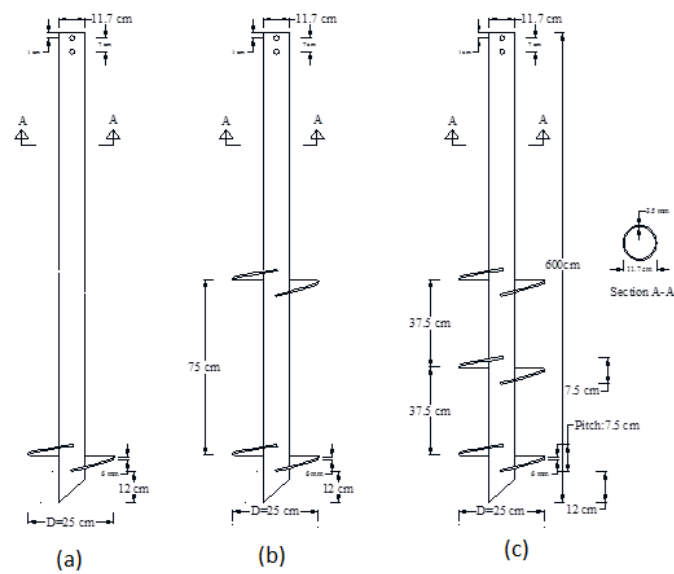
Typical test helical piles configurations, a) single helix pile; b) double helix pile; c) triple helix pile
